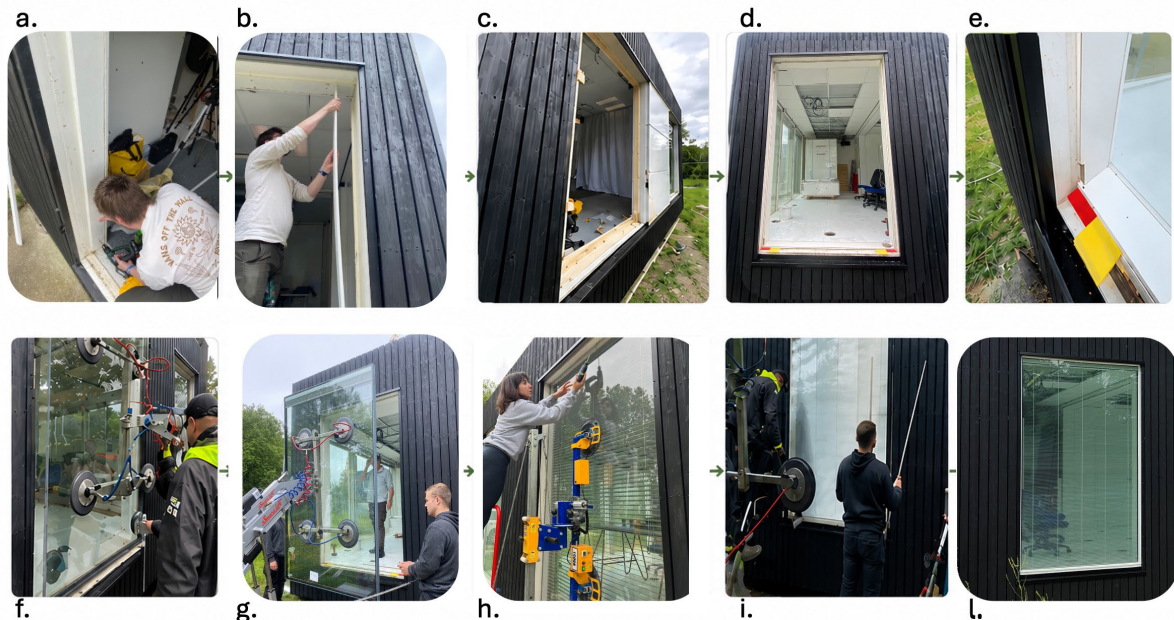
Images of the step-by-step installation of façade specimen and the reconfigurable test rig and timber frames: a-b-c. positioning of tailored timber frames to host new façade components to be tested; d-e. preparation of spacer and packers to allow tolerance during the installation; f.-g. the positioning of new façade specimen, in this case glazings, by mean of manual or automated glass lifter; h-i. re-positioning of the timber frame to conclude the installation; l. example of the finalized installation.
